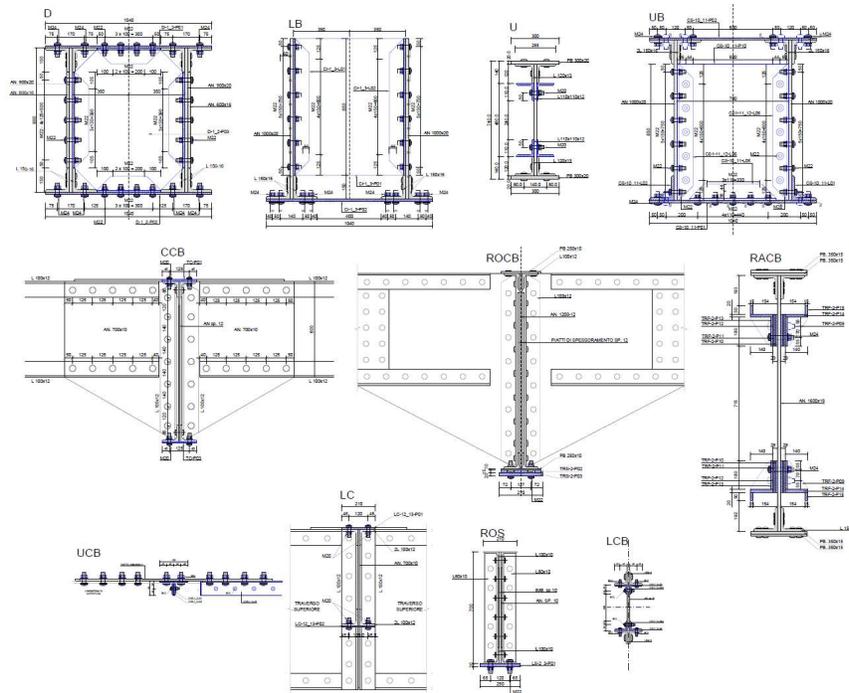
Structural element profile sections – Example reinforcements (in blue)
